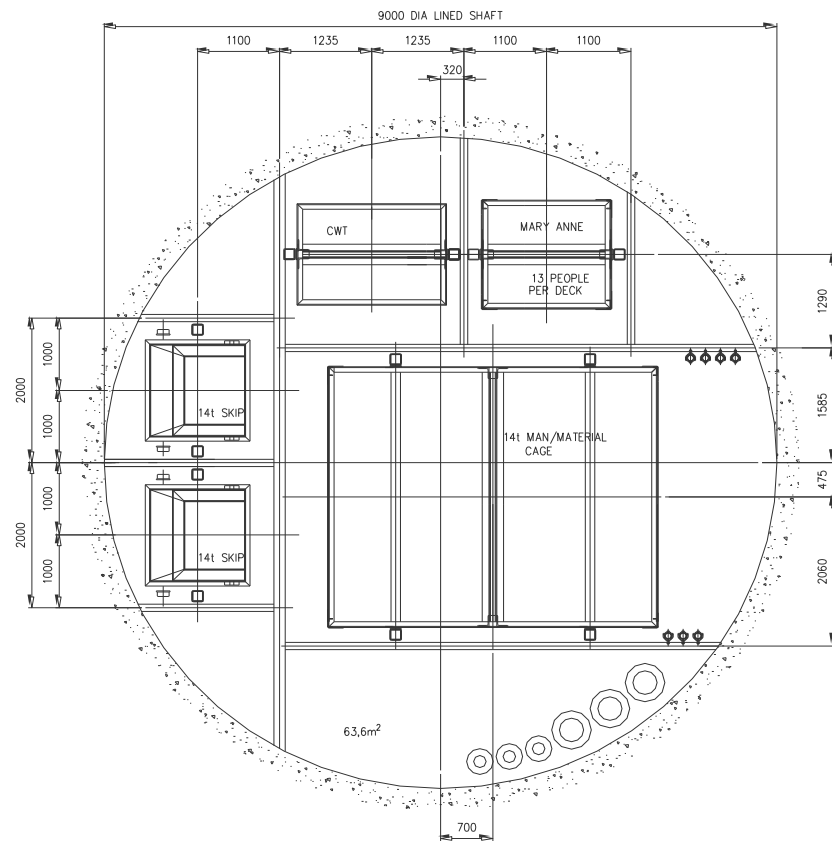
CROSS SECTION OF MAIN SHAFT
